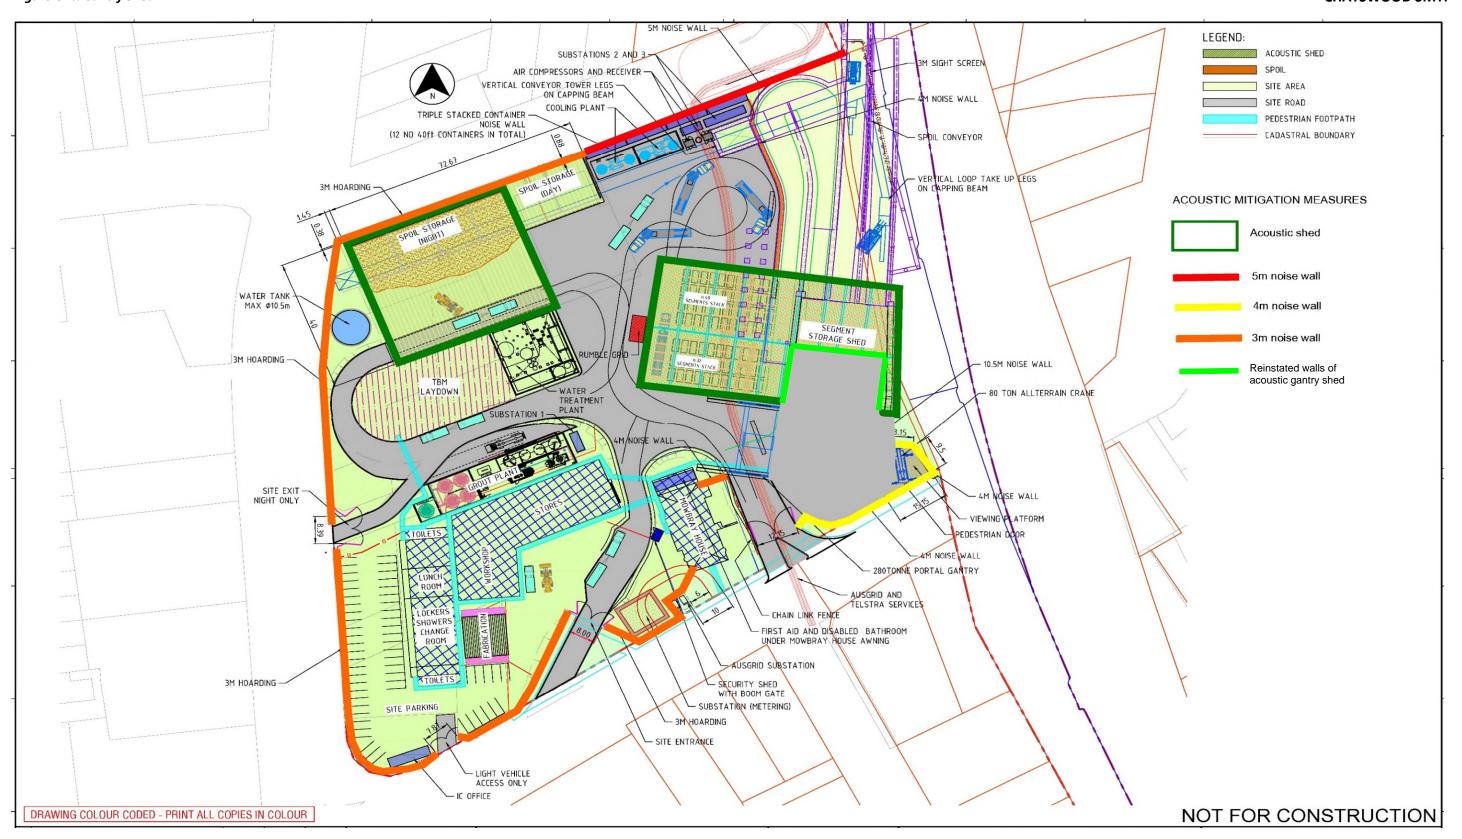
Construction Site Layout Figure C1b: Gantry Shed
